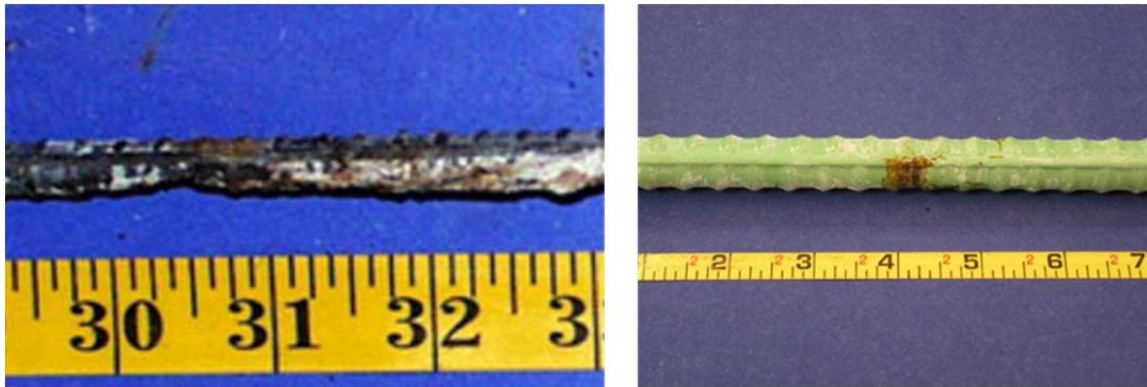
Typical Longitudinal Bar from Project 0-14058 (Left) and Project 0-4562 (Right)
